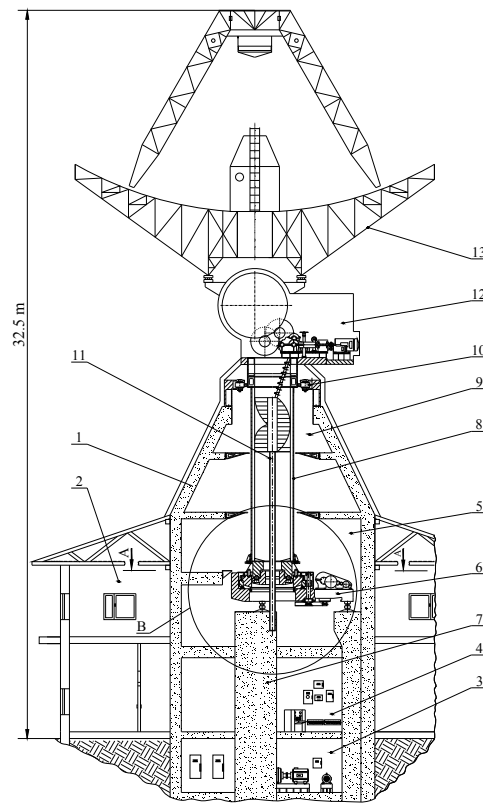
Arrangement of the antenna frame and positioning system of RT-16 radio-telescope. 1 – 6-storey reinforced concrete supporting structure; 2 – 2-storey circular extension; 3 – 1st floor: basement for DC converters and switchgear cabinets; 4 – 2nd floor: stand control panels and switchboards with circuit breakers for three-phase voltage commutation; 5 – 3rd-4th floors: thrust bearing and azimuthal rotation drive unit; 6 – fixed support platform; 7 – reinforced support legs; 8 – vertical column axle of azimuthal rotation; 9 – 6th floor: measuring equipment of azimuthal rotation; 10 – upper roller bearing for axial rotation; 11 – protective casing of the azimuthal measuring axle; 12 – rotating cabin with the elevation drive unit; 13 – antenna frame.
